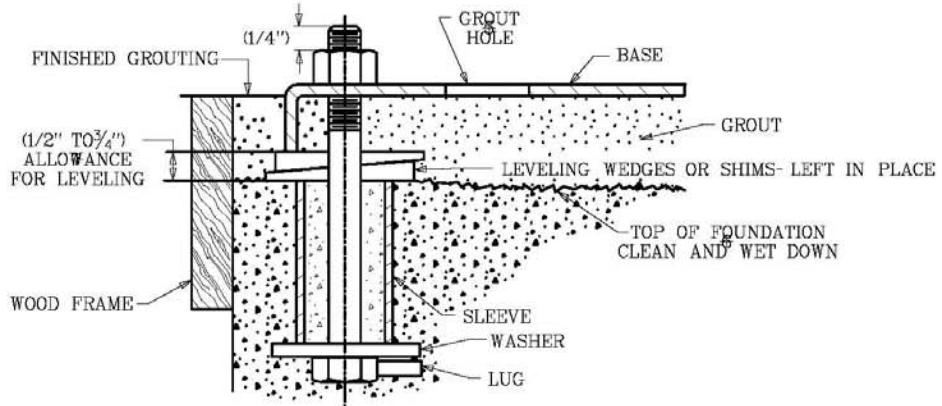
TYPICAL FOUNDATION BOLT DESIGN
